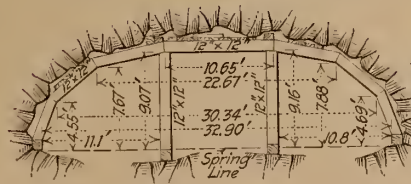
TIMBERING METHODS, SECTION 8 LEXINGTON AVE. TUNNEL
